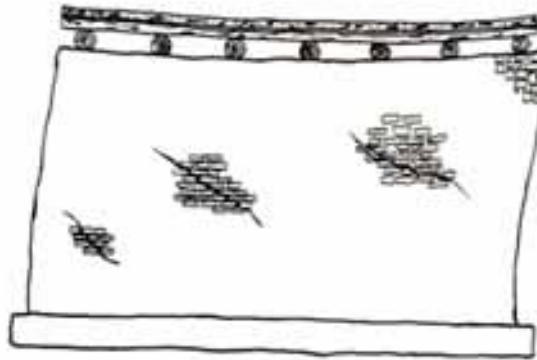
Cantilever wall collapse mode (After Ref.5)
